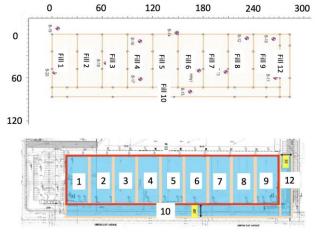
Building model with surcharge loads and borings layout (numbers in the figure are associated to each Fill)
